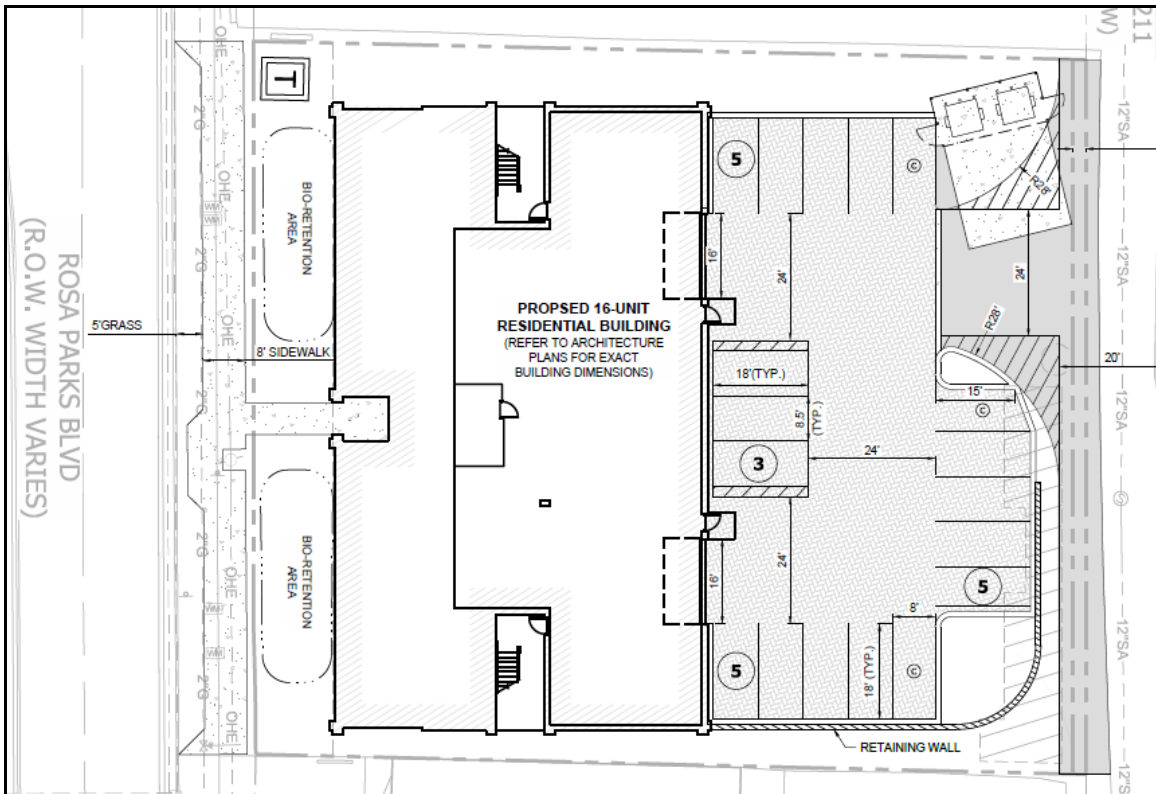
Site plan. Secondary entrances and walkways not showing here, but will be provided.
